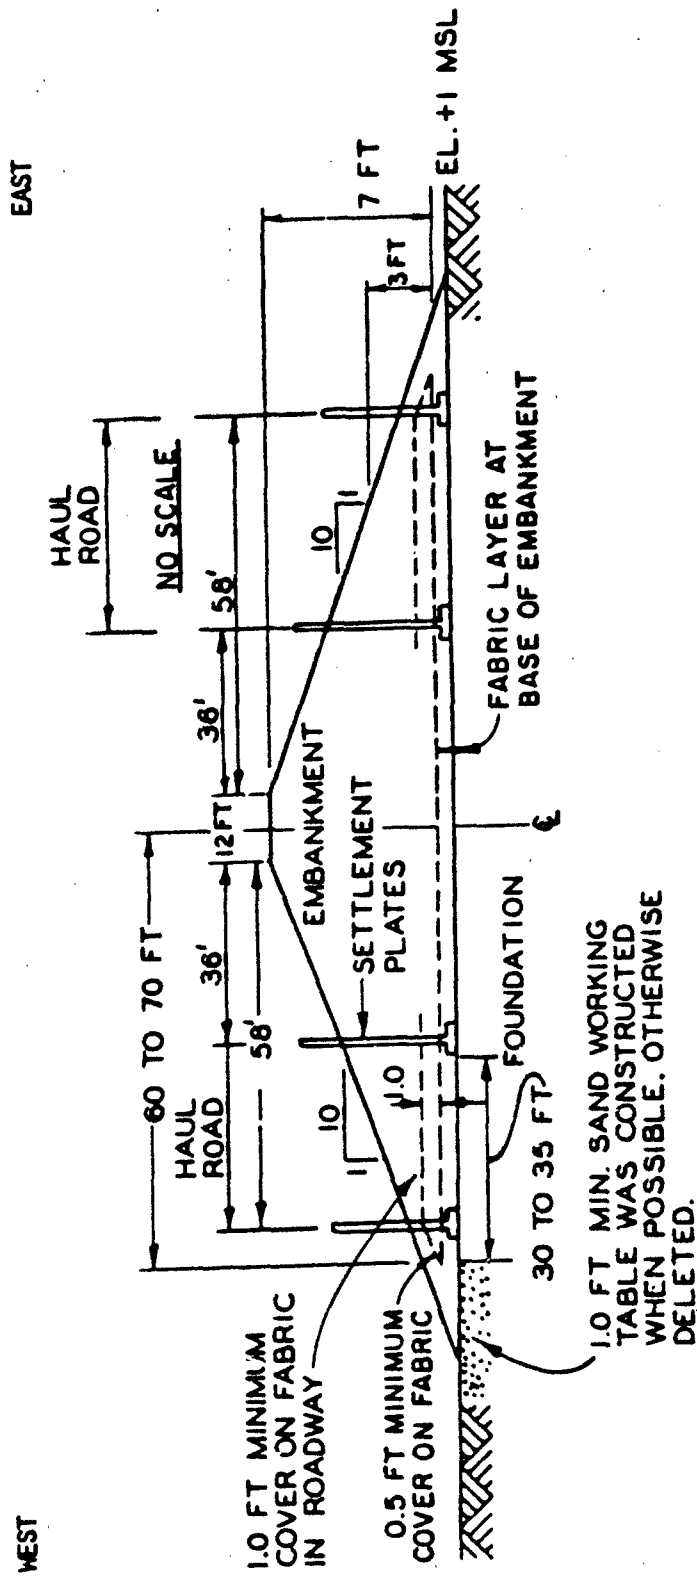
Typical Design Cross Section for Pinto Pass Fabric-Reinforced Dike
